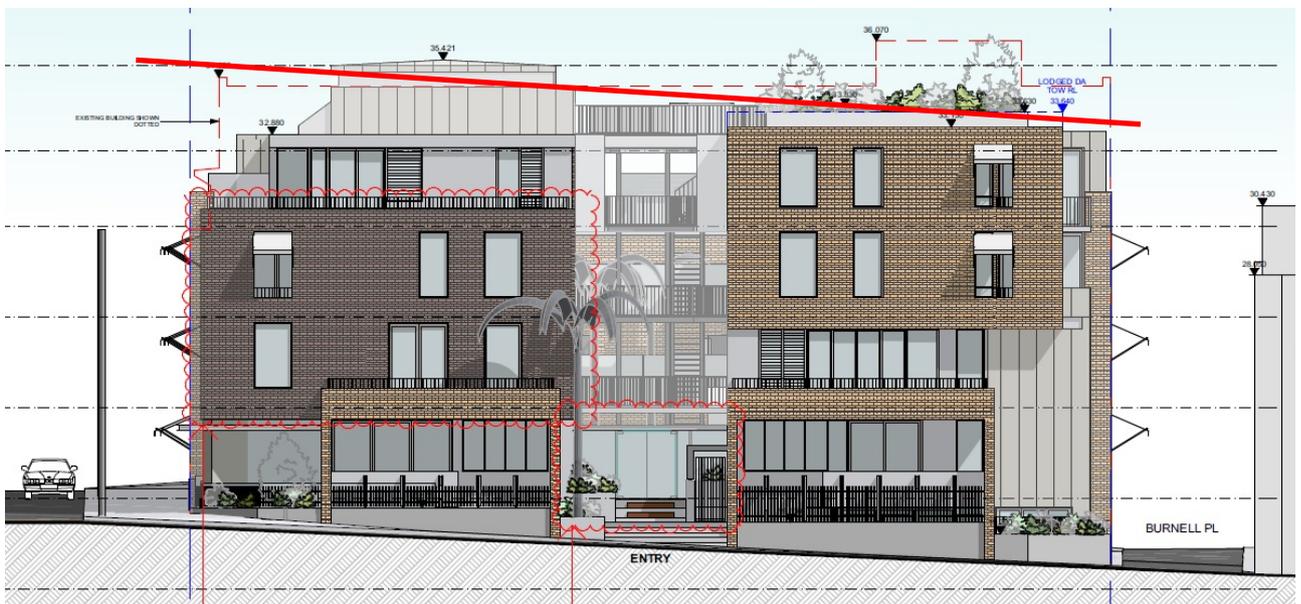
Northern elevation of proposal with 15m LEP height limit shown
